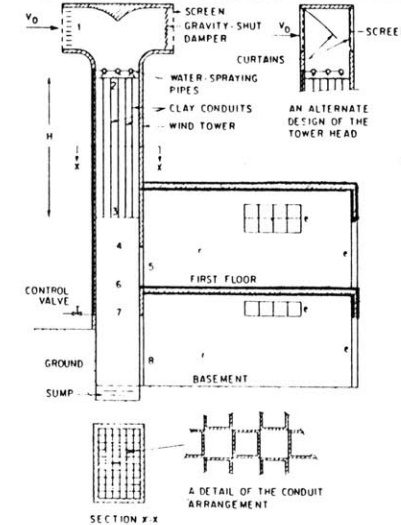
a. Cross Section of Improved Wind Tower, (Source : Bahadori, Ref. 28)
